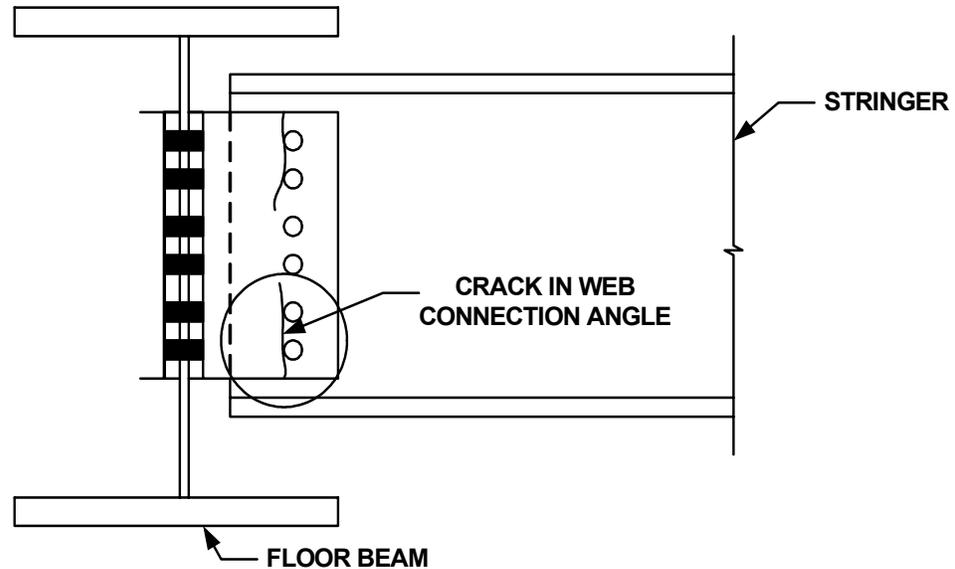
Cracked Stringer to Floorbeam Connection Angle
